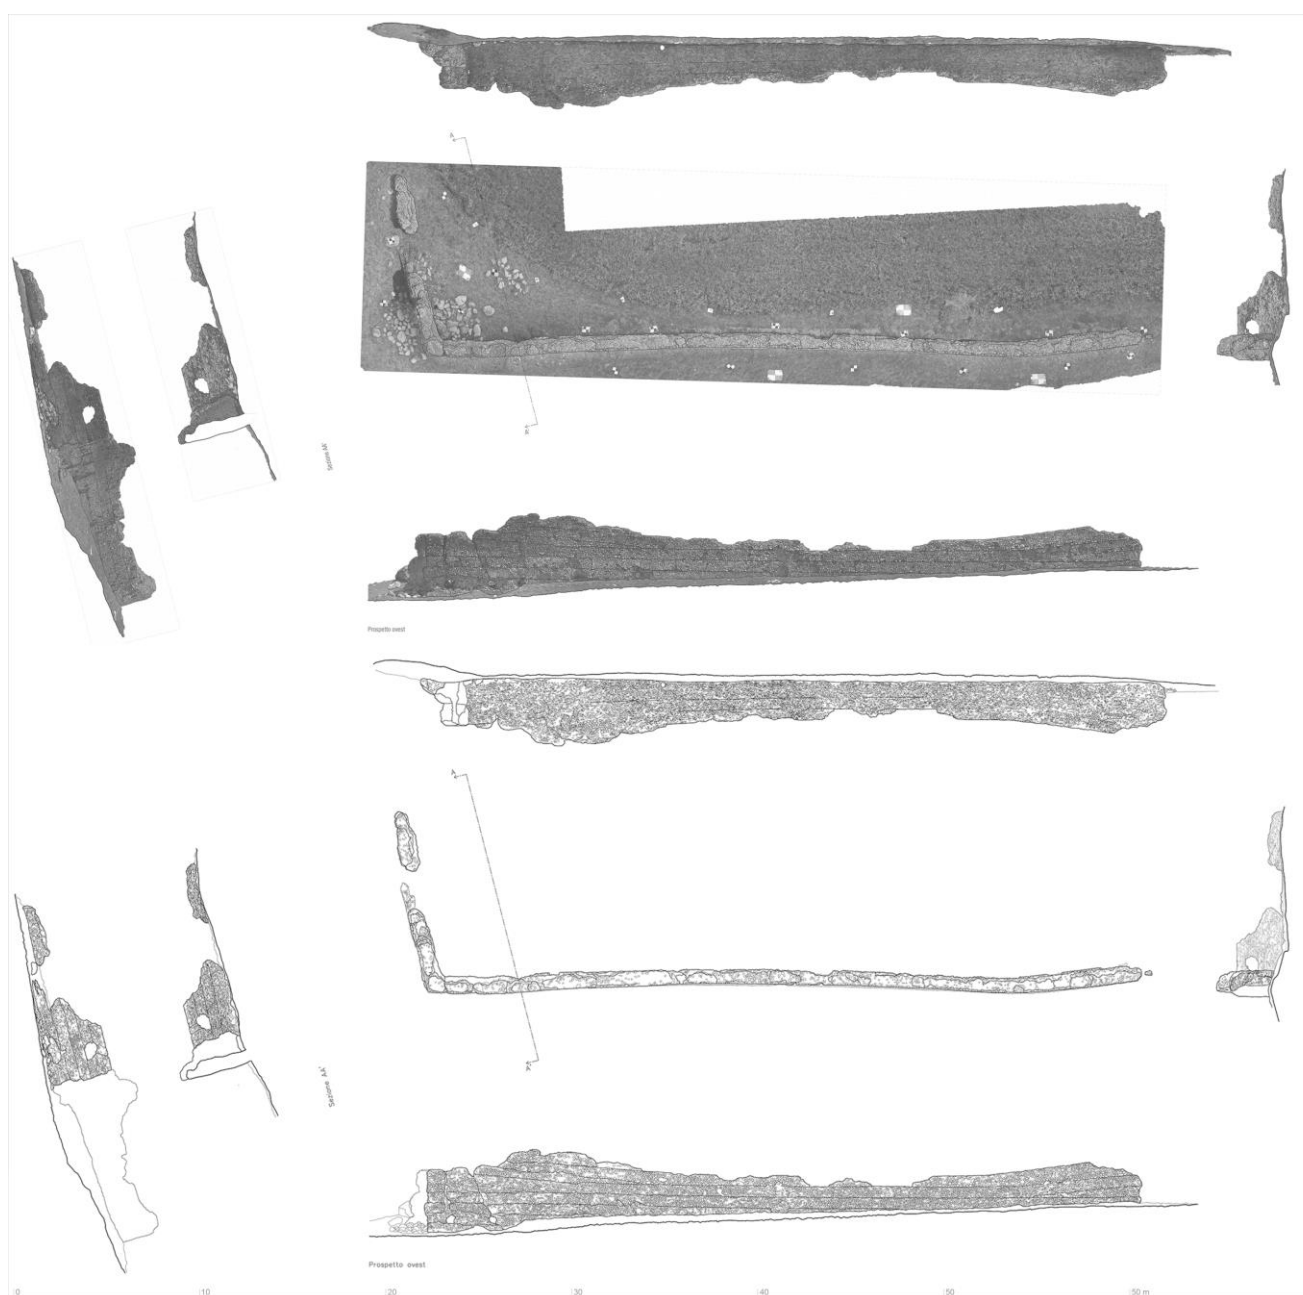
Bidimensional graphics: plan and sections of the south-east wall
